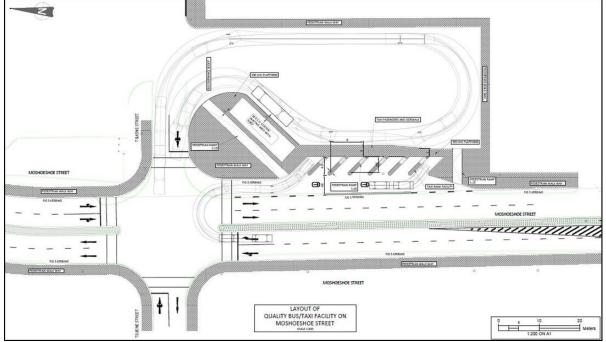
Proposed Alternative 1 Layout of Bus/taxi transfer station
